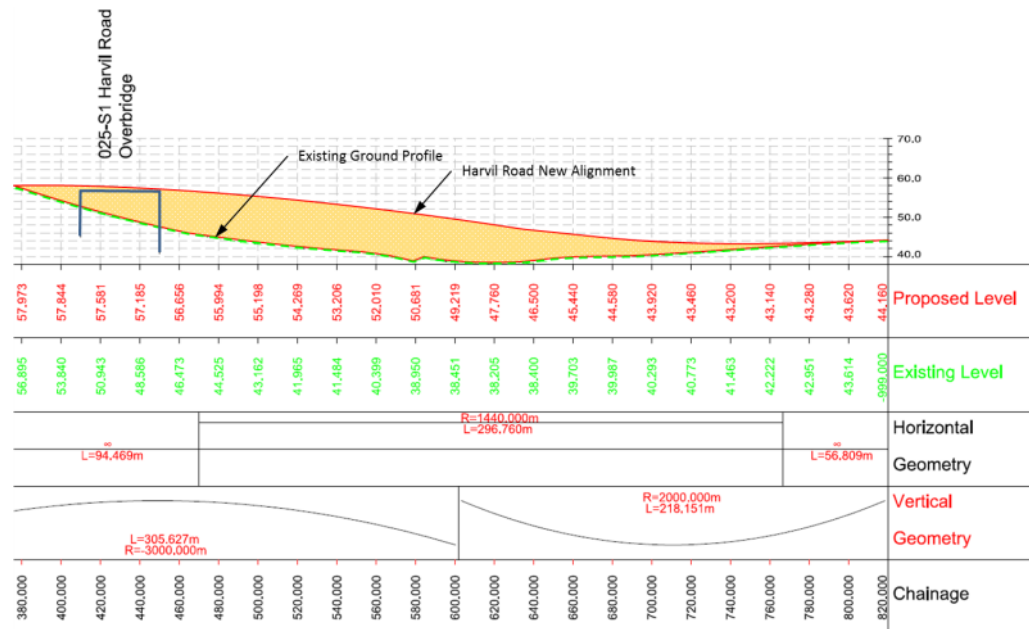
Longitudinal section of embankment along re-aligned Harvil Road
